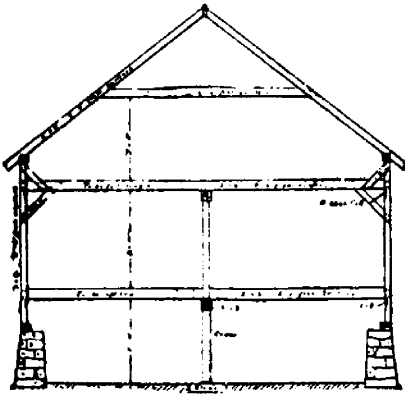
CROSS SECTION OF APPLE HOUSE.
